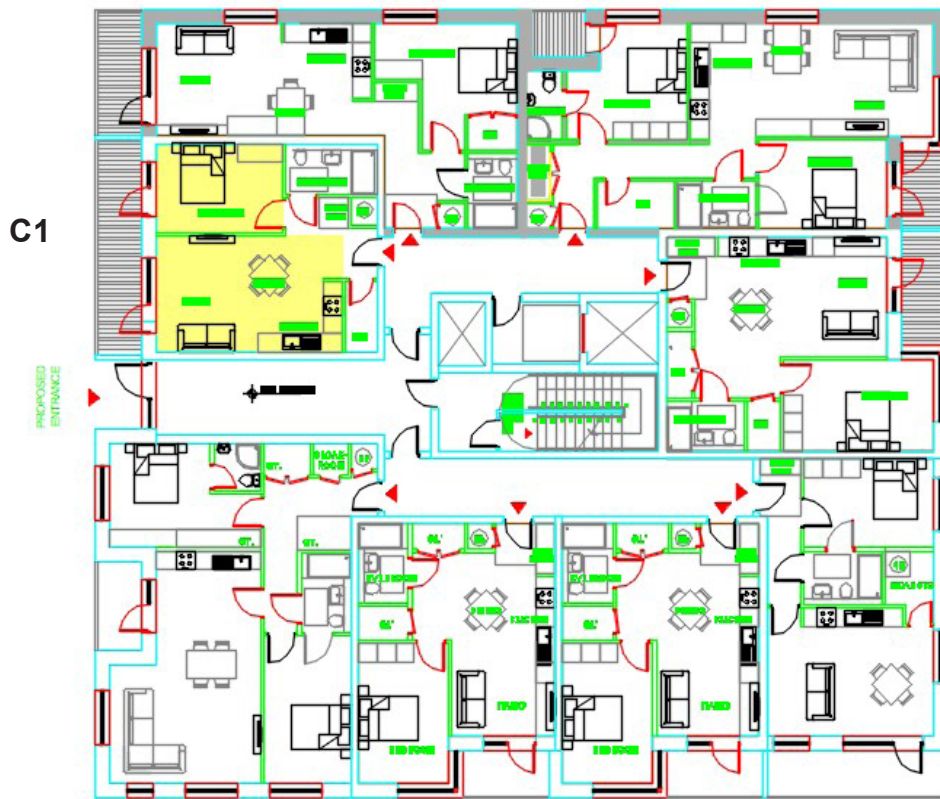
Ground Floor Plan of Block C indicating rooms assessed for Daylight
